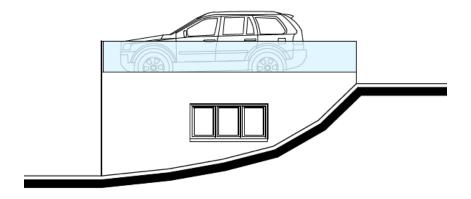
Proposed south elevation. Extract from drawing number: 1610/P-102
